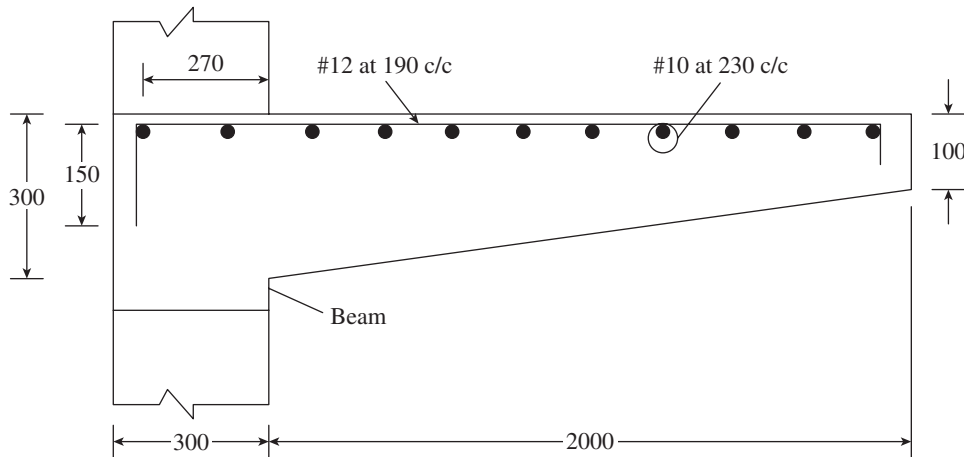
Detailing of cantilever slab of Example 9.3
